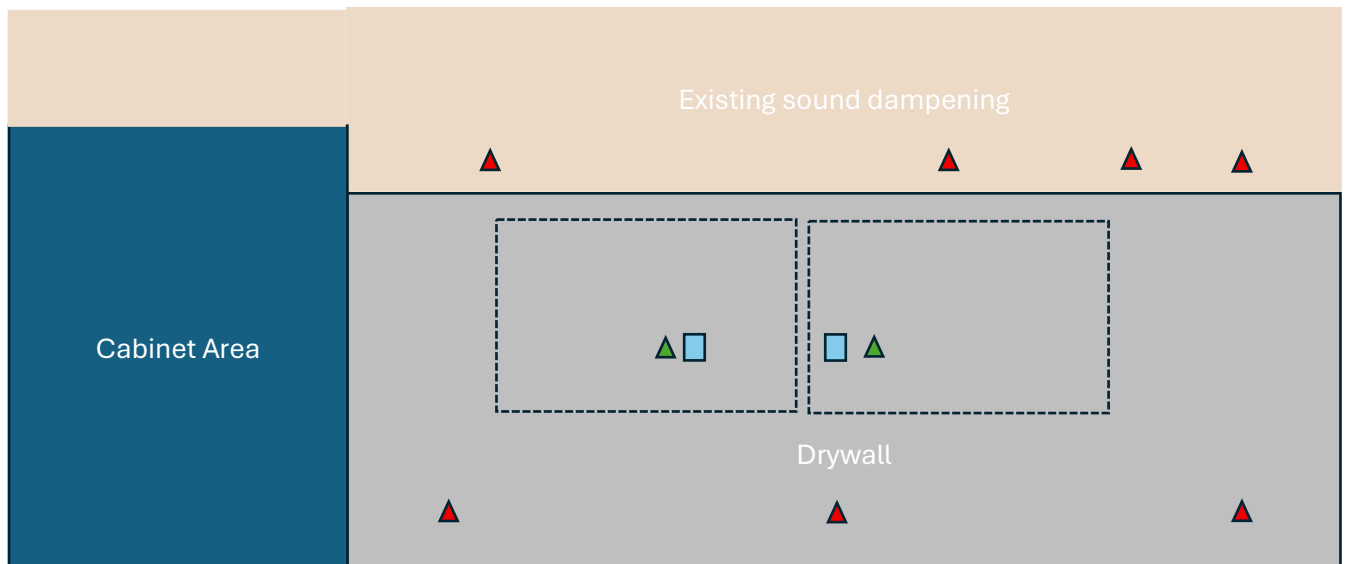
Classroom West Wall. The smart board in the middle is covering an outlet that may be able to be reused for the new monitor. A second outlet on the wall is intended for this wall as well.
